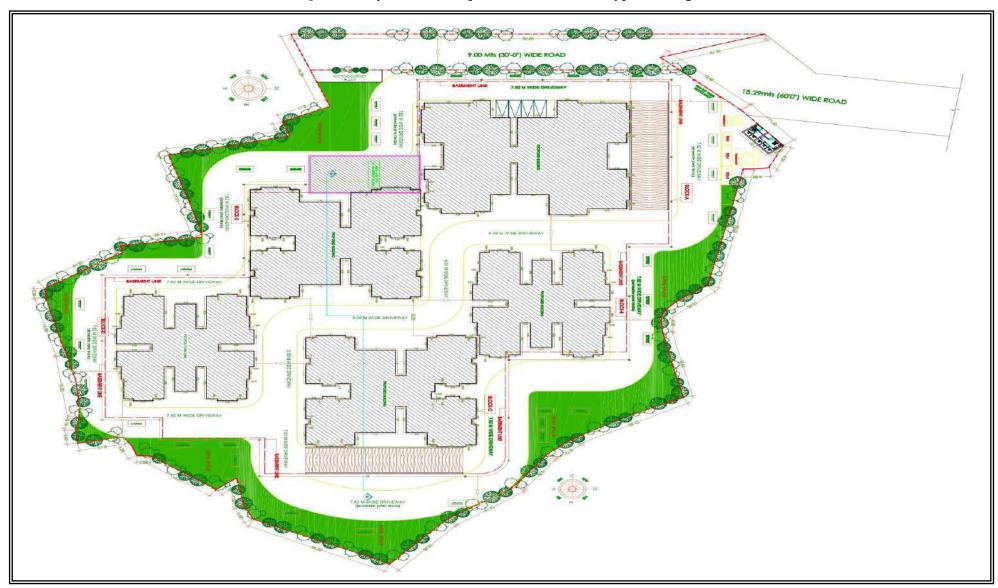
Layout of the Proposed Residential Use Type Building
